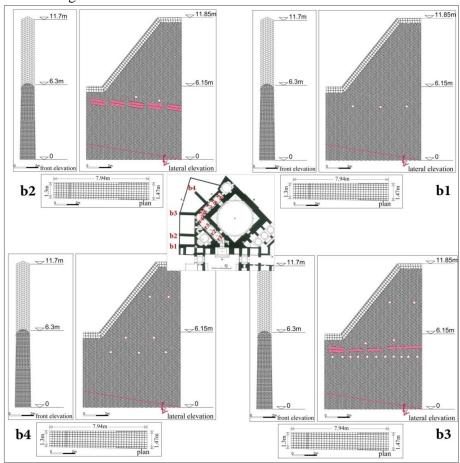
Plan, front elevation and side elevation of buttresses of Sheikh Lotfollah Mosque
